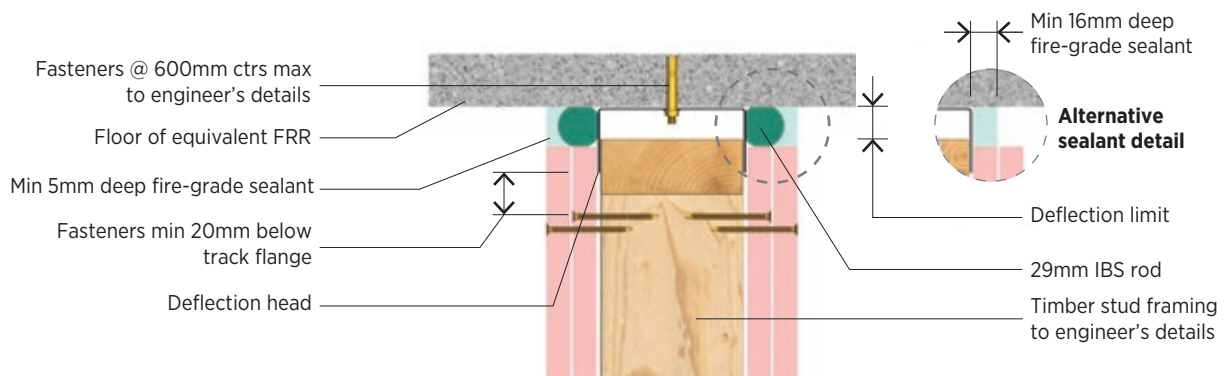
Standard Timber Stud Wall - Deflection Head Detail
